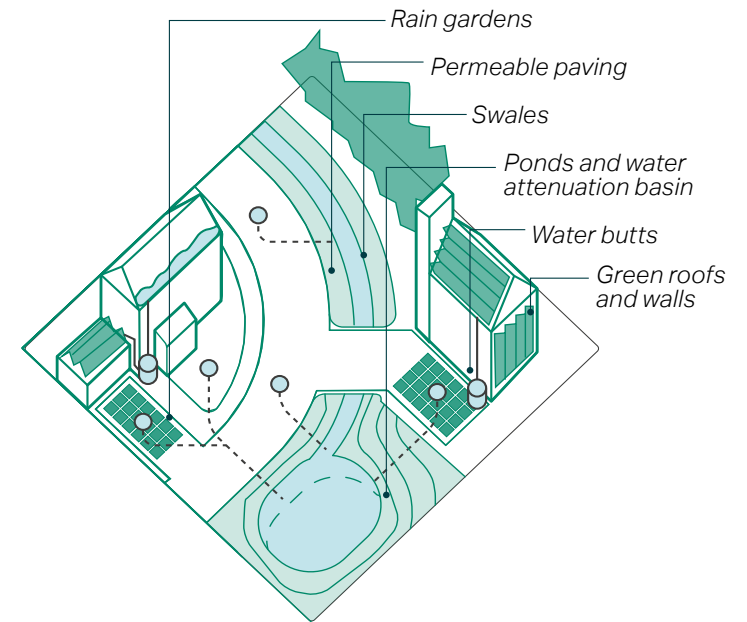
Diagram showing the best use of harvesting water systems, rain garden, swales, permeable paving and green roofs.
